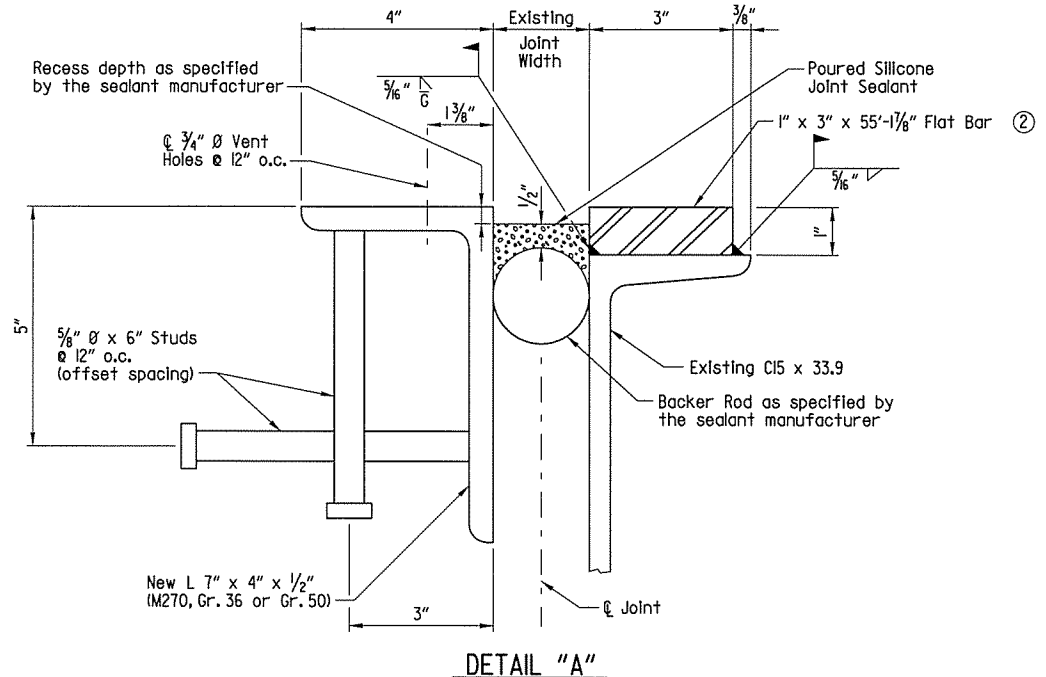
DETAILS OF BACKWALL REPAIR - CONSTRUCTION
